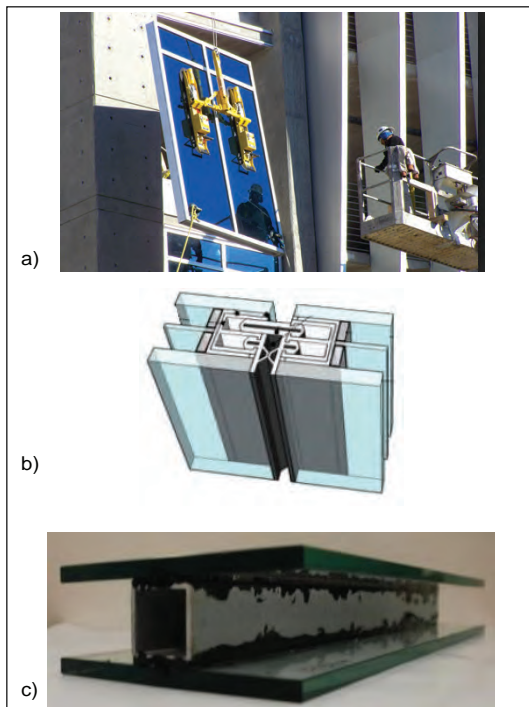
a) Installation of traditional non-integrated frame utilised panels for curtain wall systems, with b) connection detail between adjacent facade modular units and c) GFRP-glass design concept
